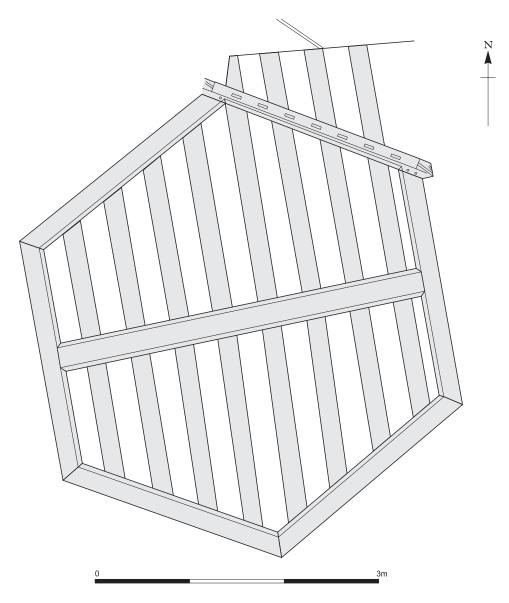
Reflected plan of ceiling joists, showing chamfered edges and empty mortices for screen across entrance. (After John Pigeon).
